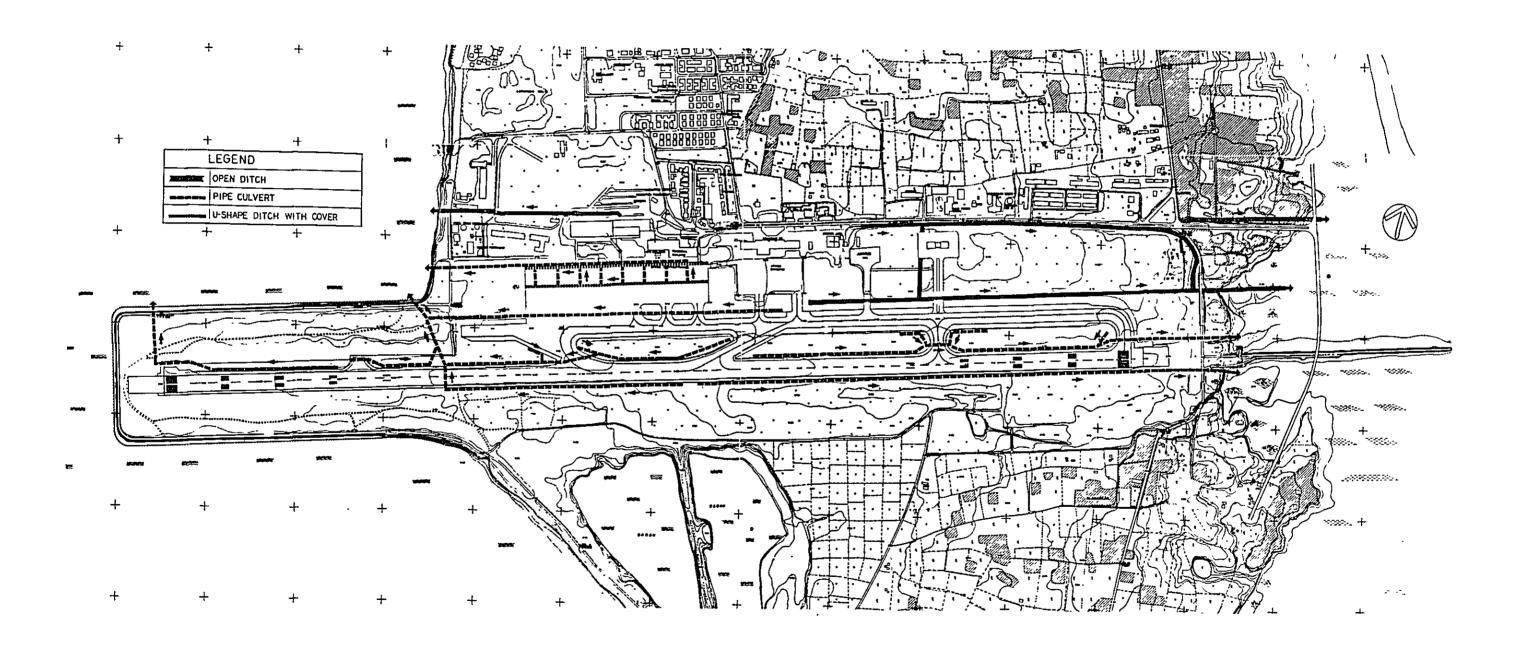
Fig. A EXISTING STORM WATER DRAINAGE SYSTEM
